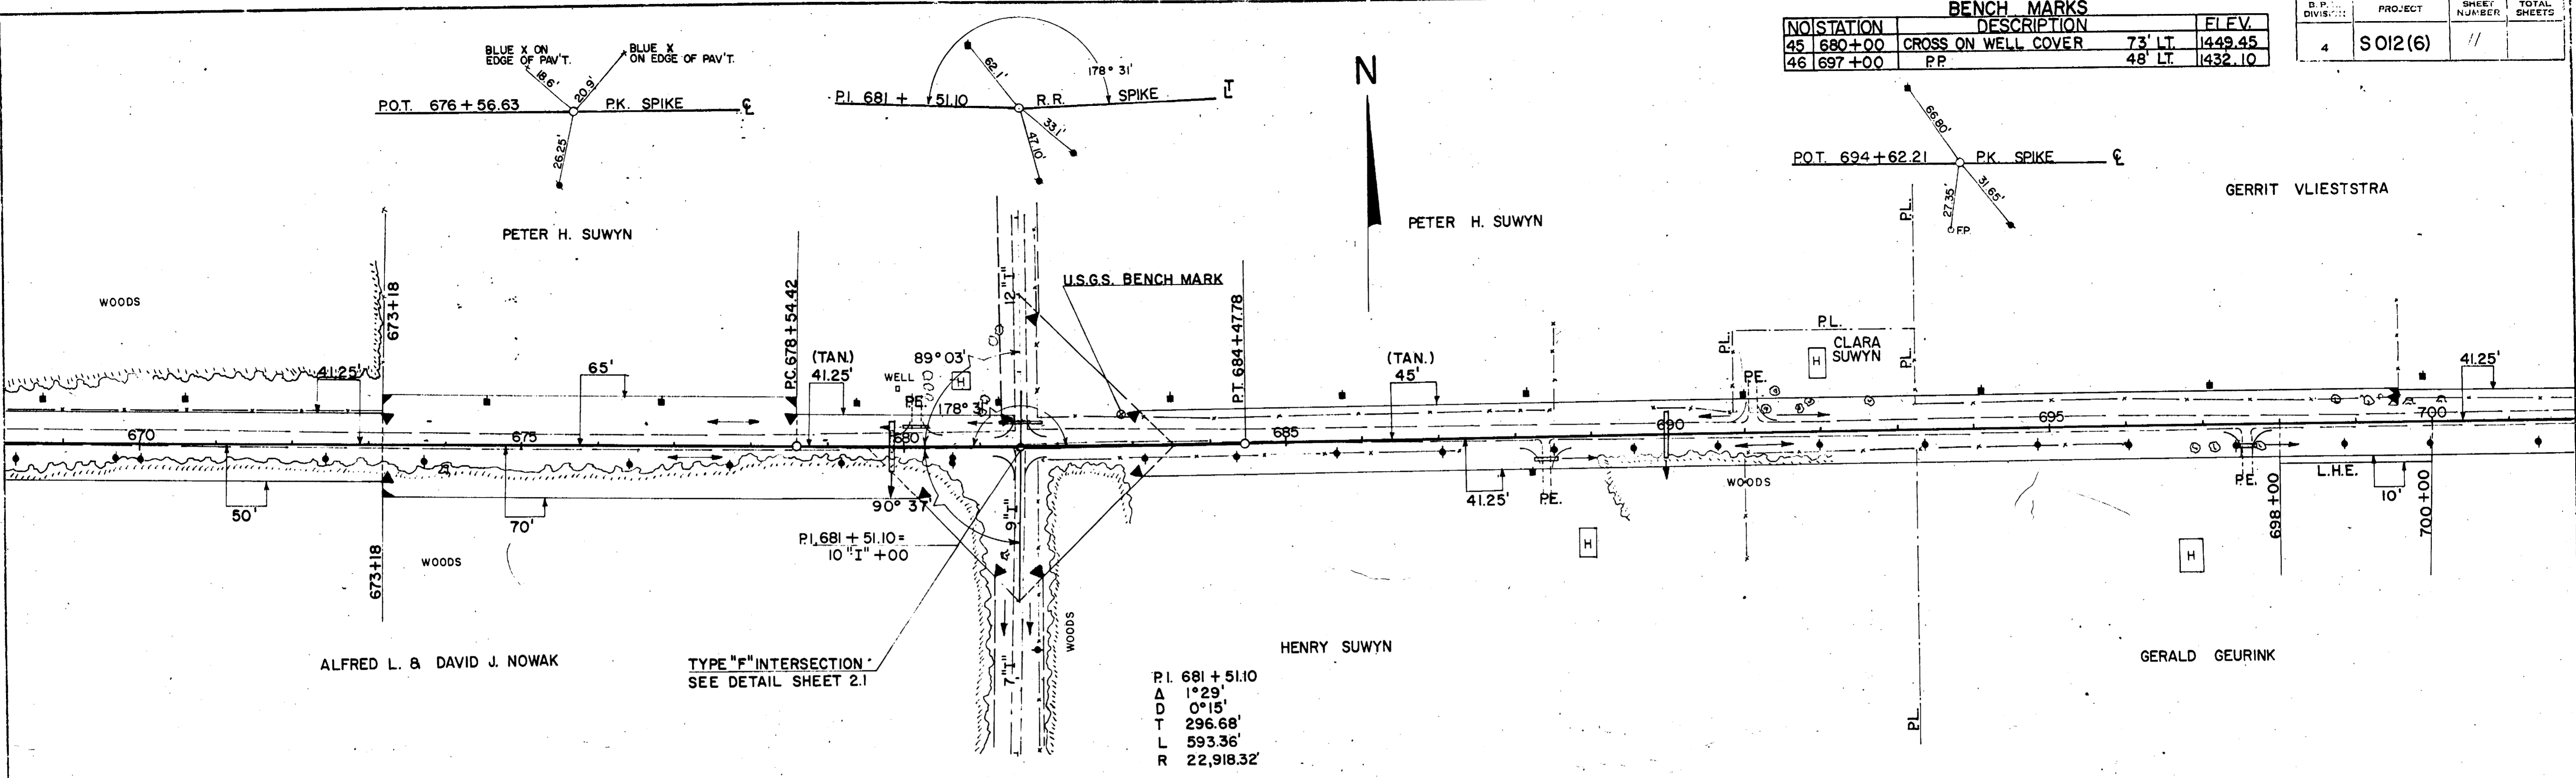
PLAN-PROFILE B.P.H. STANDARD
